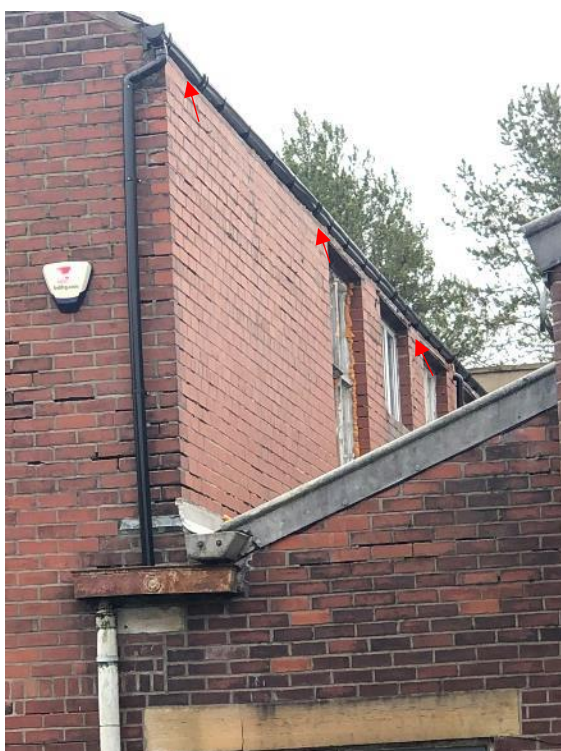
Gap on south east corner where wooden soffit is damaged (PRF2).
